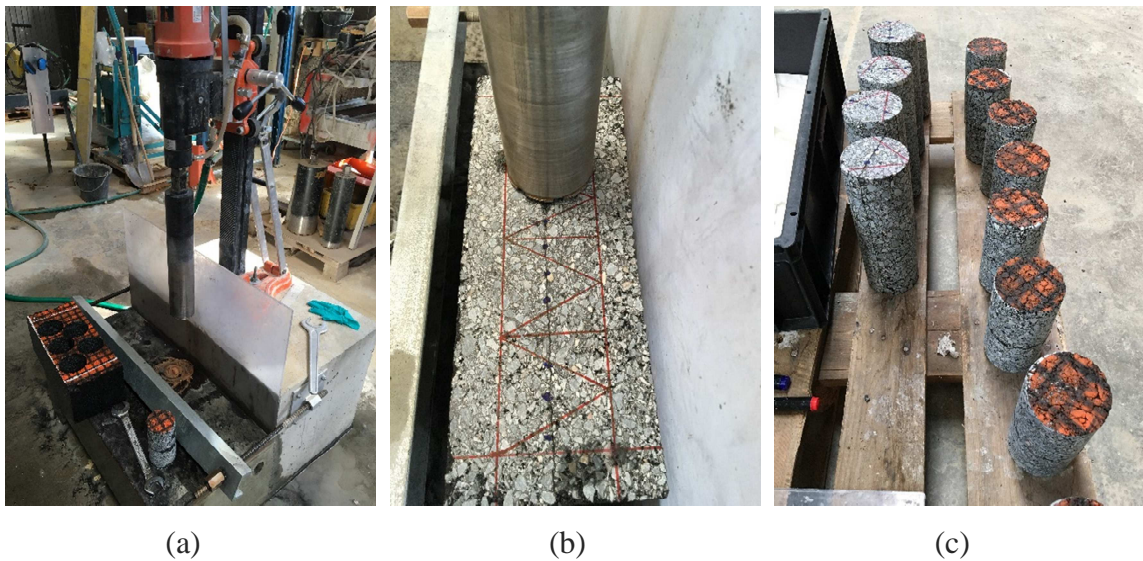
Coring of 75mm diameter cylindrical specimens from slab: (a) Coring machine, (b) Type H specimen coring, and (c) Types H (left) and V (right) cored specimens before the final trimming
